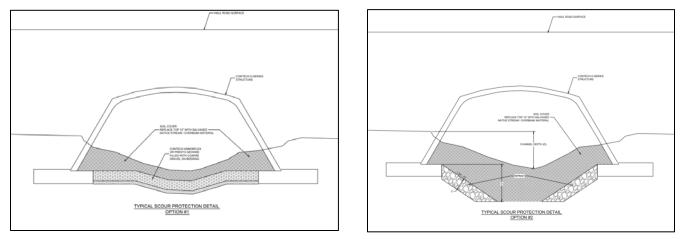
Scour Protection Options for Open Bottom Arch Structure Footings
